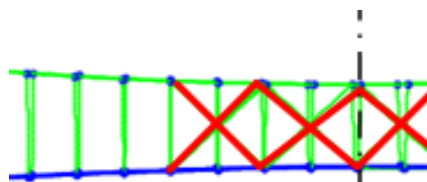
Vertical Bracing Pattern at Center of 40 m Span Footbridge
